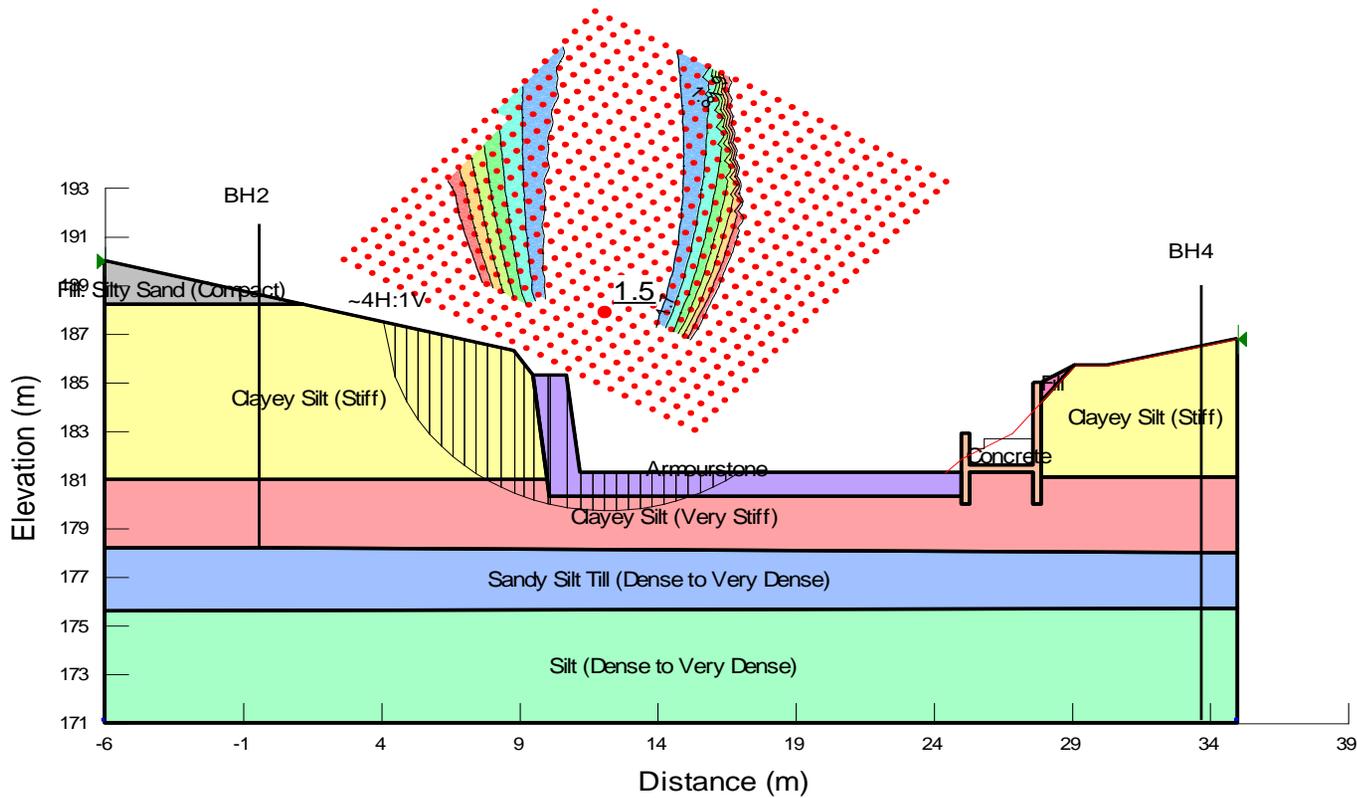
Slope stability analysis for retaining wall – drained static conditions
